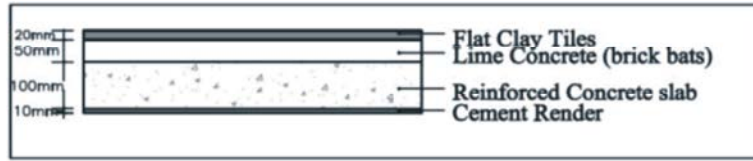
Schematic diagram of Flat clay tiles laid on cement concrete on the Reinforced concrete slab
